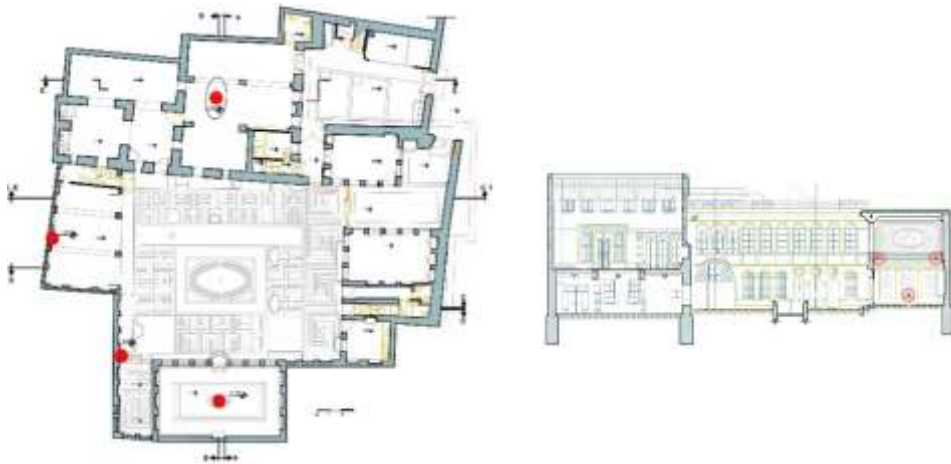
FAKHRY monitoring instruments position .plan, section.
